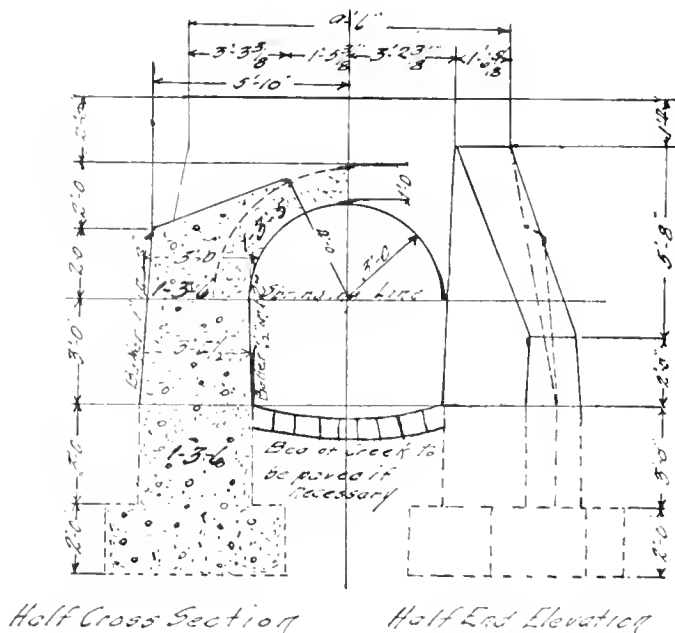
Standard (N. T. Ry.) Semi-circular Arch, 10-Foot Span.
